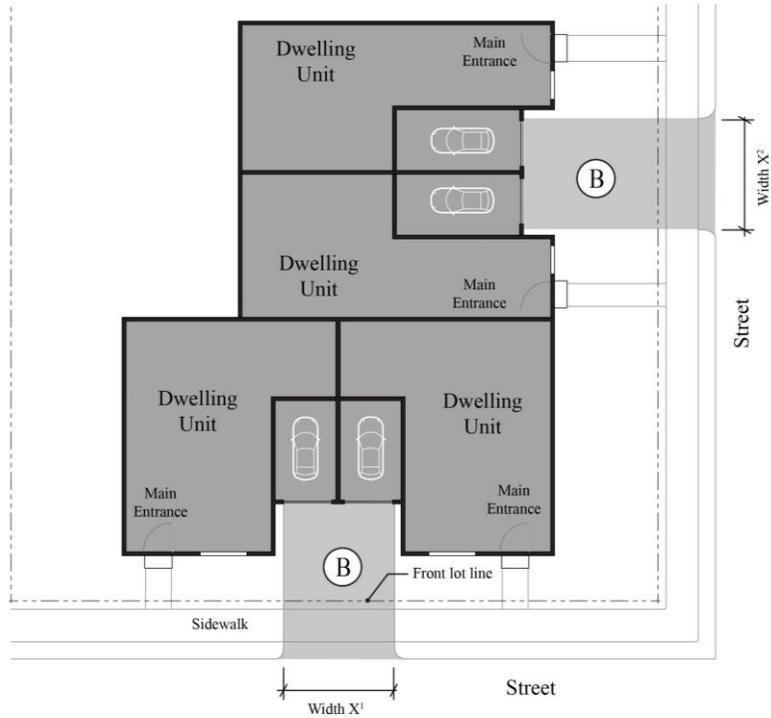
Triplex/Fourplex: Driveway Approach Options— +Driveways on Both Frontages
